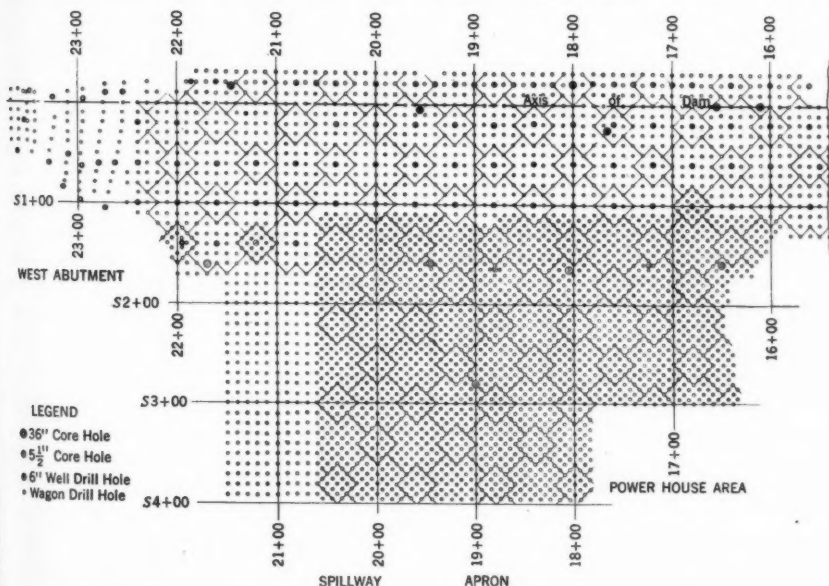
PART PLAN OF SHALLOW GROUT HOLES AND INVESTIGATION HOLES
